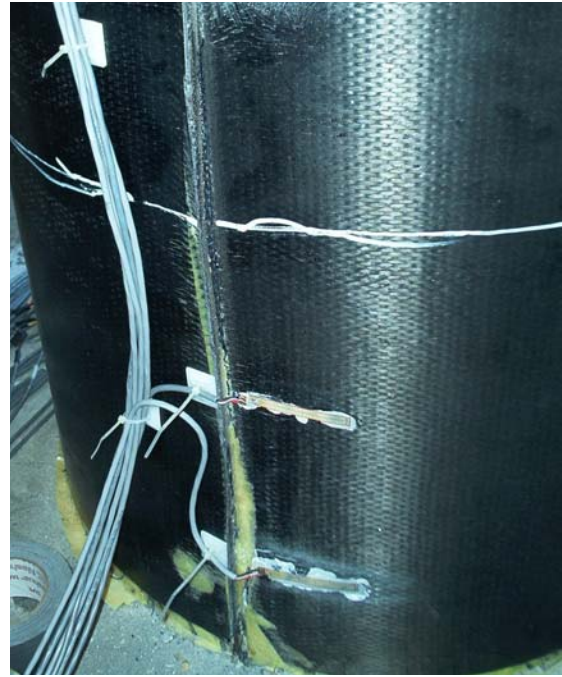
Composite Jacket Breaking in Hoop Direction of Column
